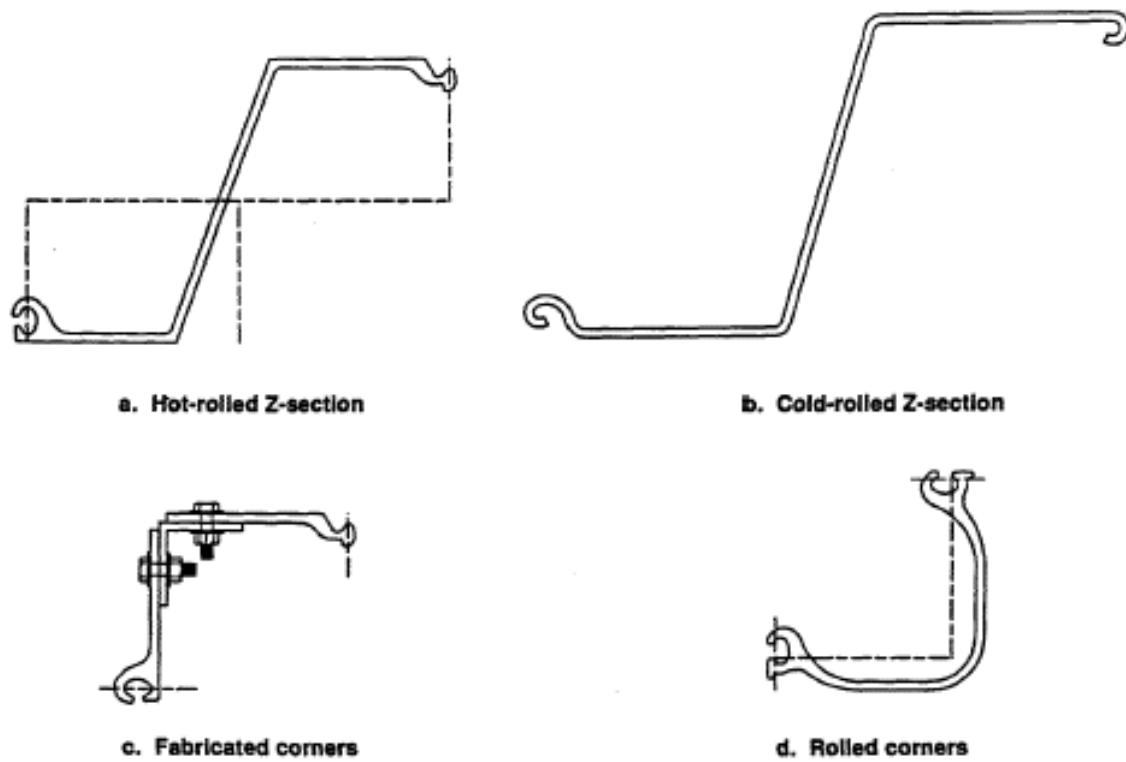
The configuration of heavy-gauge steel sheet pile (website of Atlantic Sheet Pile, Inc.)
